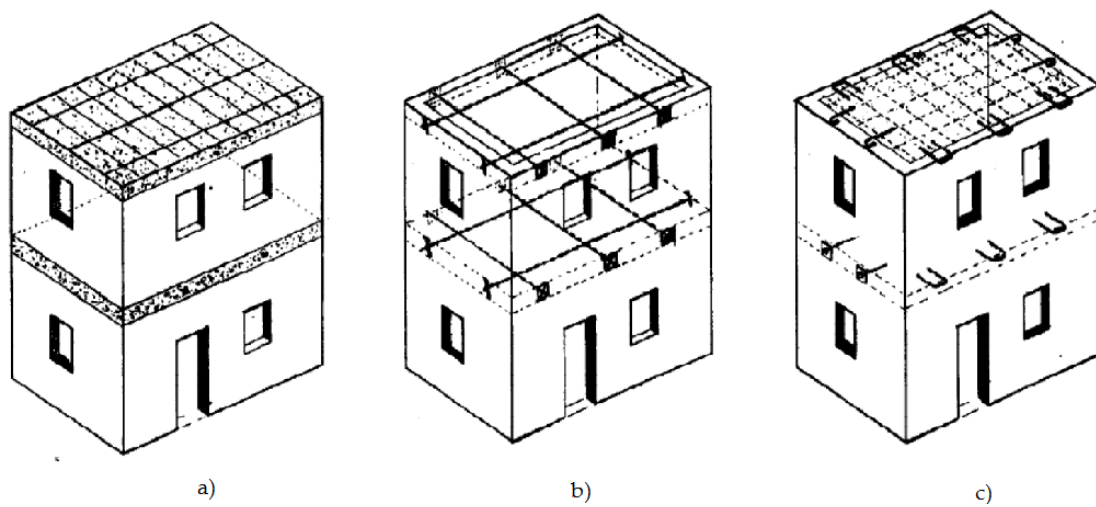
Typical connections between wall-diaphragms (adapted from [5])
